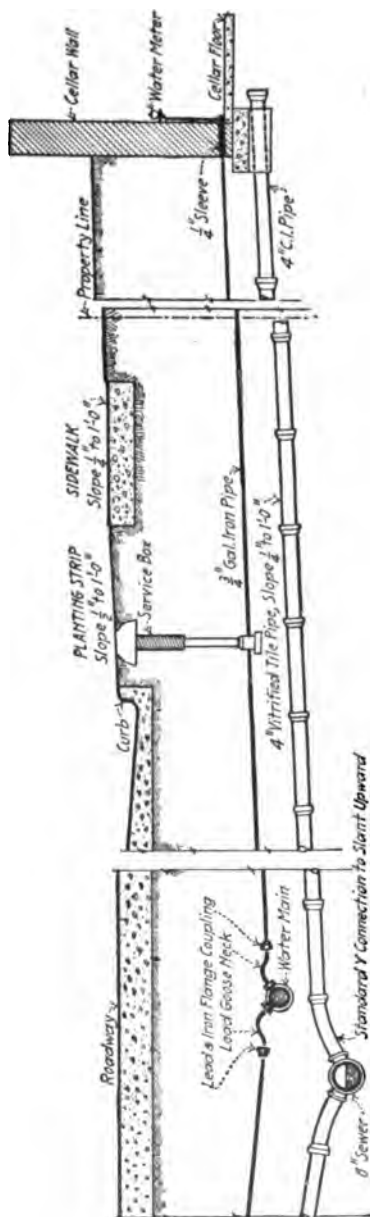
Recommended practice in location of the house water service and sewer connection.
